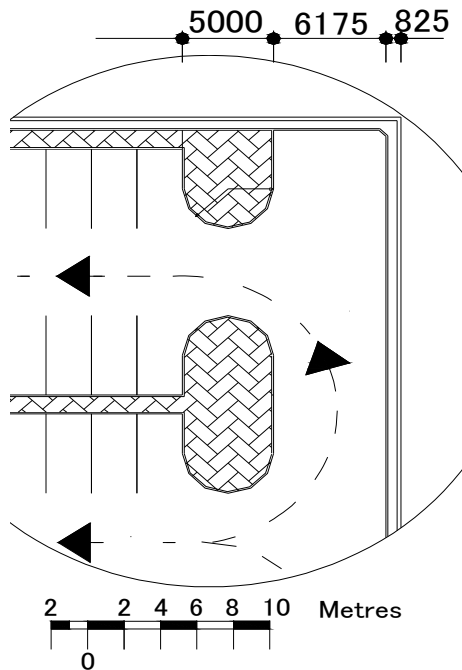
infrastructural Detail at C (PLAN). Source: author's design
